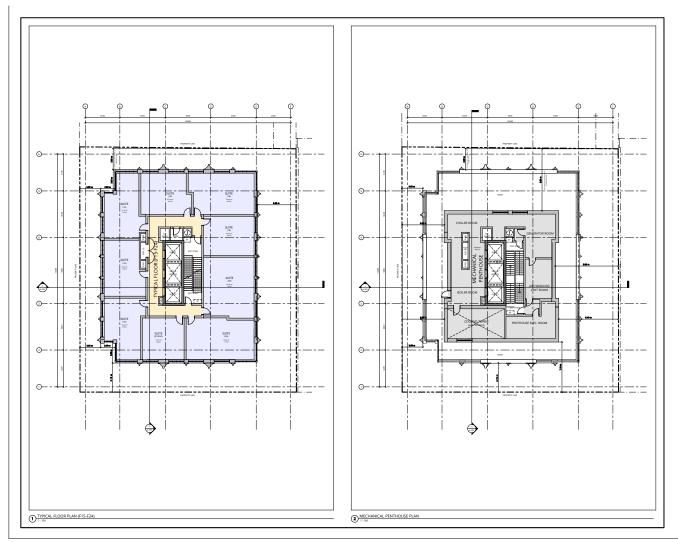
Typical Tower Floor and MPH Plans (AUDAX)
